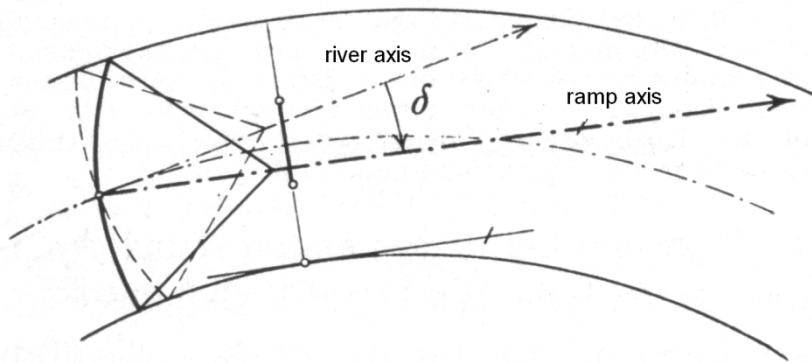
Sketch of a Schauberger ramp in a bent river section (plan view)
